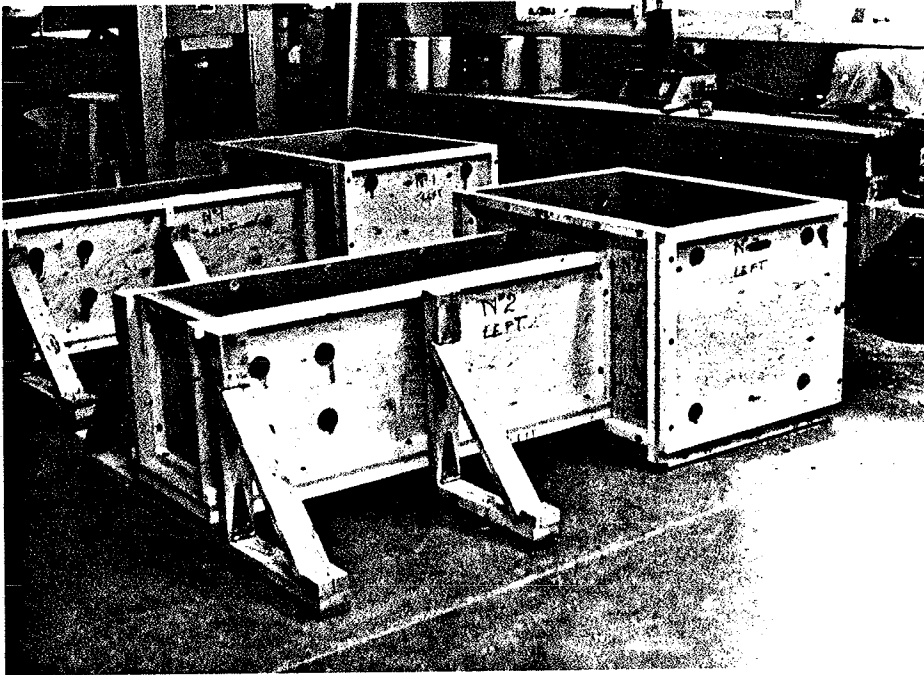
FORMWORK FOR A TYPICAL SPECIMEN
